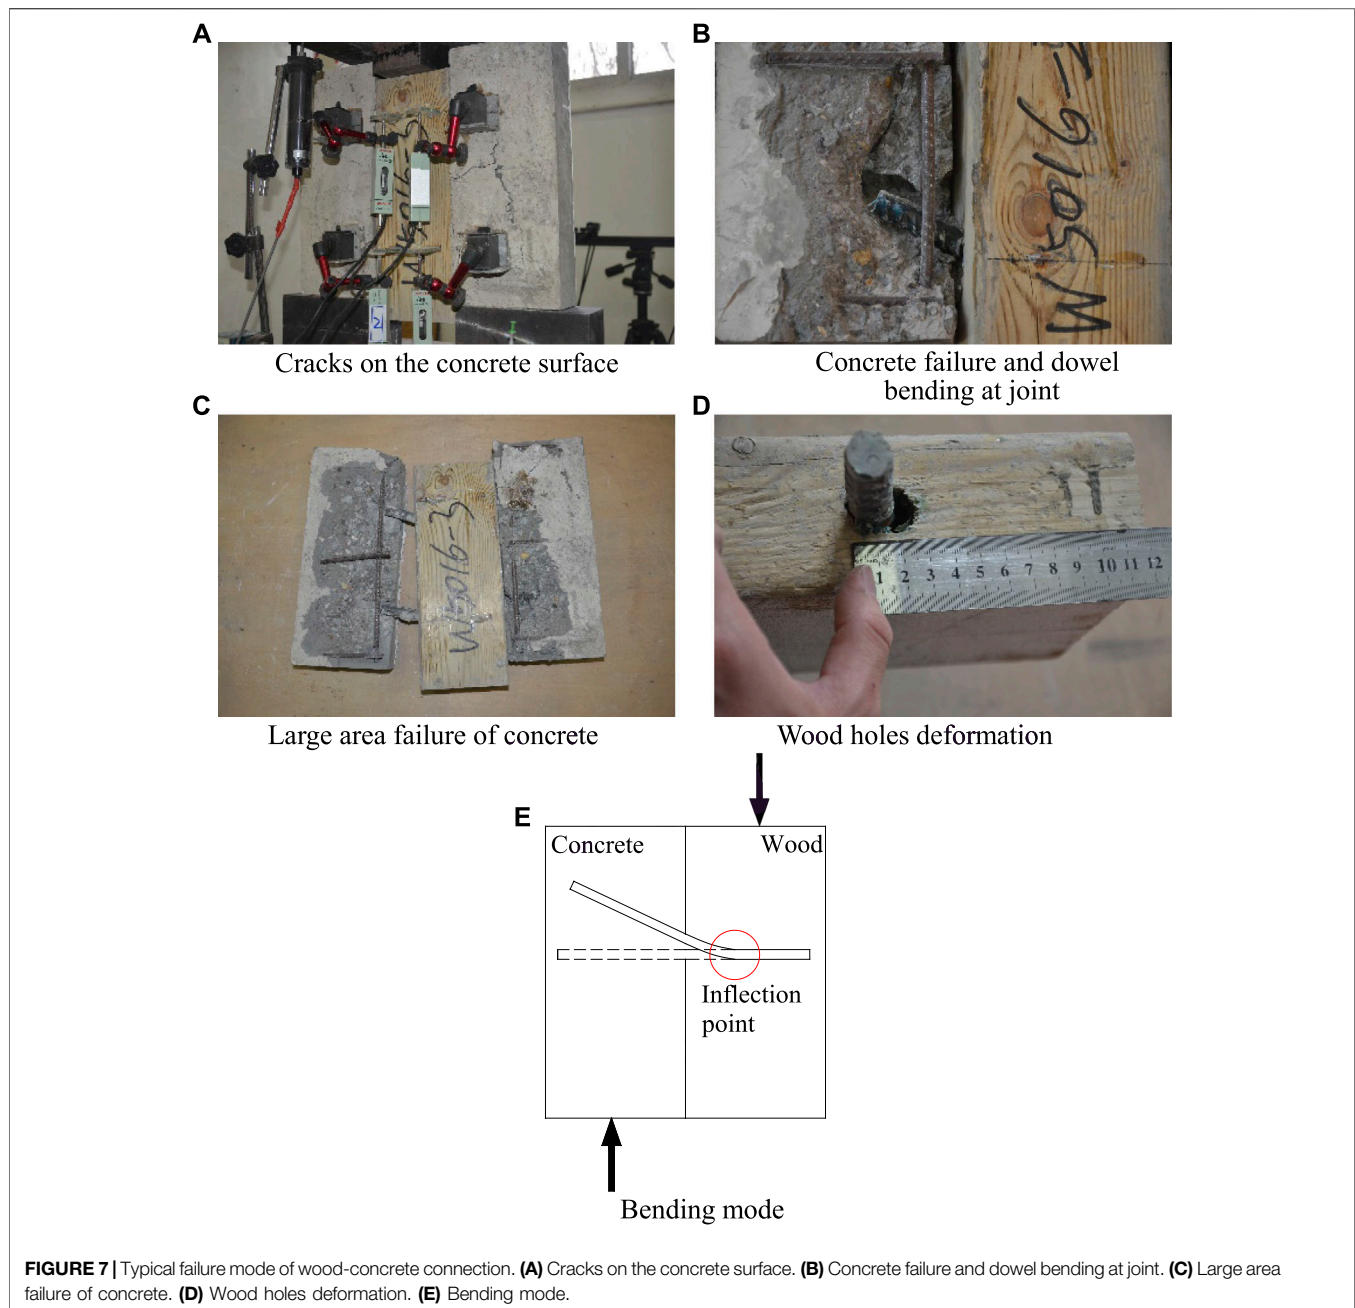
| Typical failure mode of wood-concrete connection. (A) Cracks on the concrete surface. (B) Concrete failure and dowel bending at joint. (C) Large area failure of concrete. (D) Wood holes deformation. (E) Bending mode.
